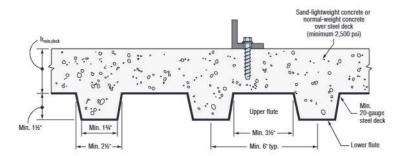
Installation of 1/4"- and %"-Diameter Anchors in the Topside of Concrete over Steel Deck
